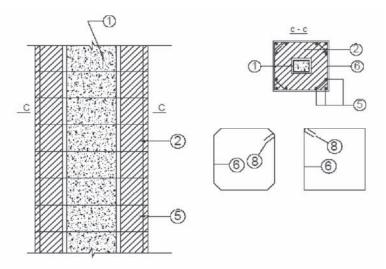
Repair of concrete columns by four-sided jacketing (1. Existing column; 2. Jacket; 3. Key; 4. Bent bars; 5. Added reinforcement; 6. Ties; 7. Welding; 8. Alternative corners)
